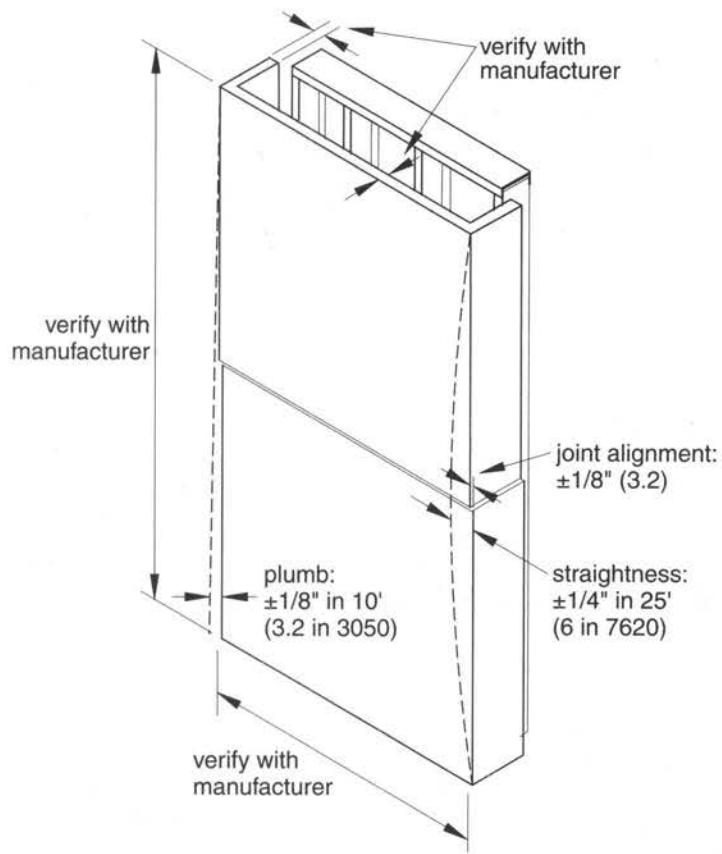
Wallboard partitions, ceilings, and trim
